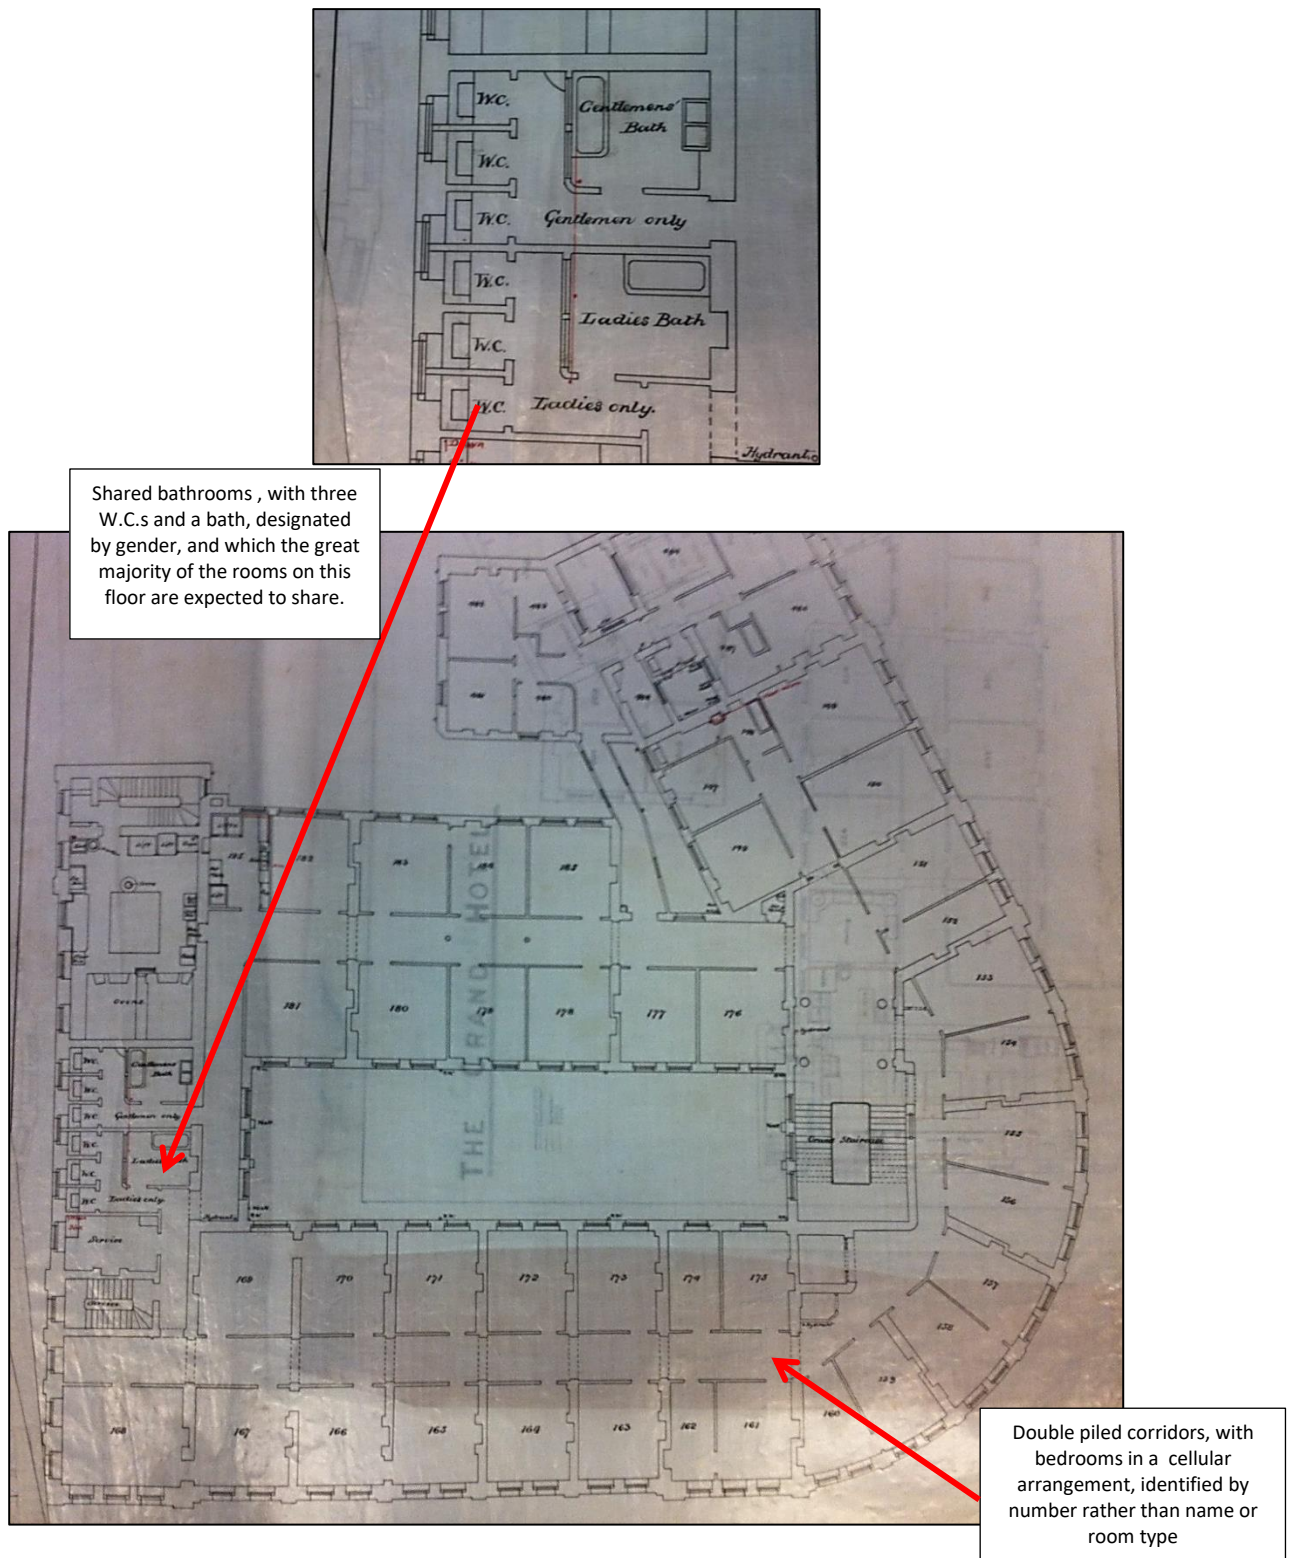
Plans of the Third Floor of the Grand, 1880 ⁷⁸⁶
